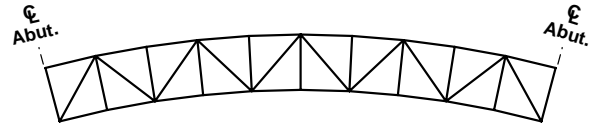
Warren-Type Single-Diagonal Top Lateral Bracing System for Tub Section Member: Plan View.
